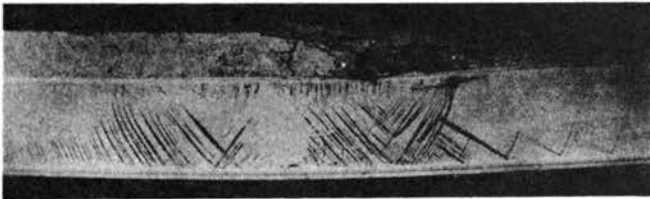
Picture of Beam 22a at the end of the test. Note the crushing of the concrete slab (flexural failure). The whole steel section was yielded in tension just before the concrete crushed. The typical compression type yield lines at the upper part of the web occurred after the crushing of the concrete when the beam started carrying loads independently.
